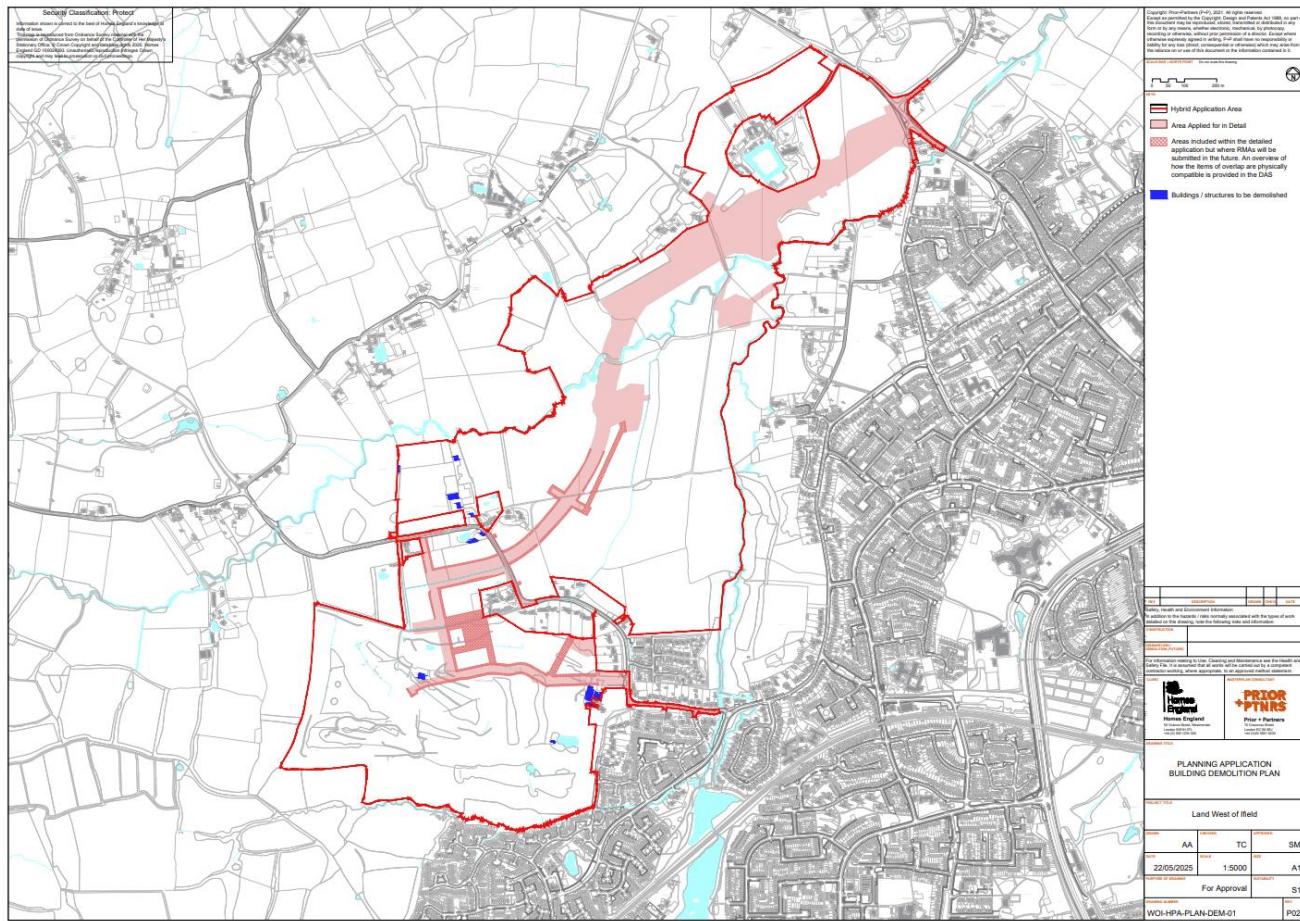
Indicative Building Demolition Plan (WOI-HPA-PLAN-DEM-01)
